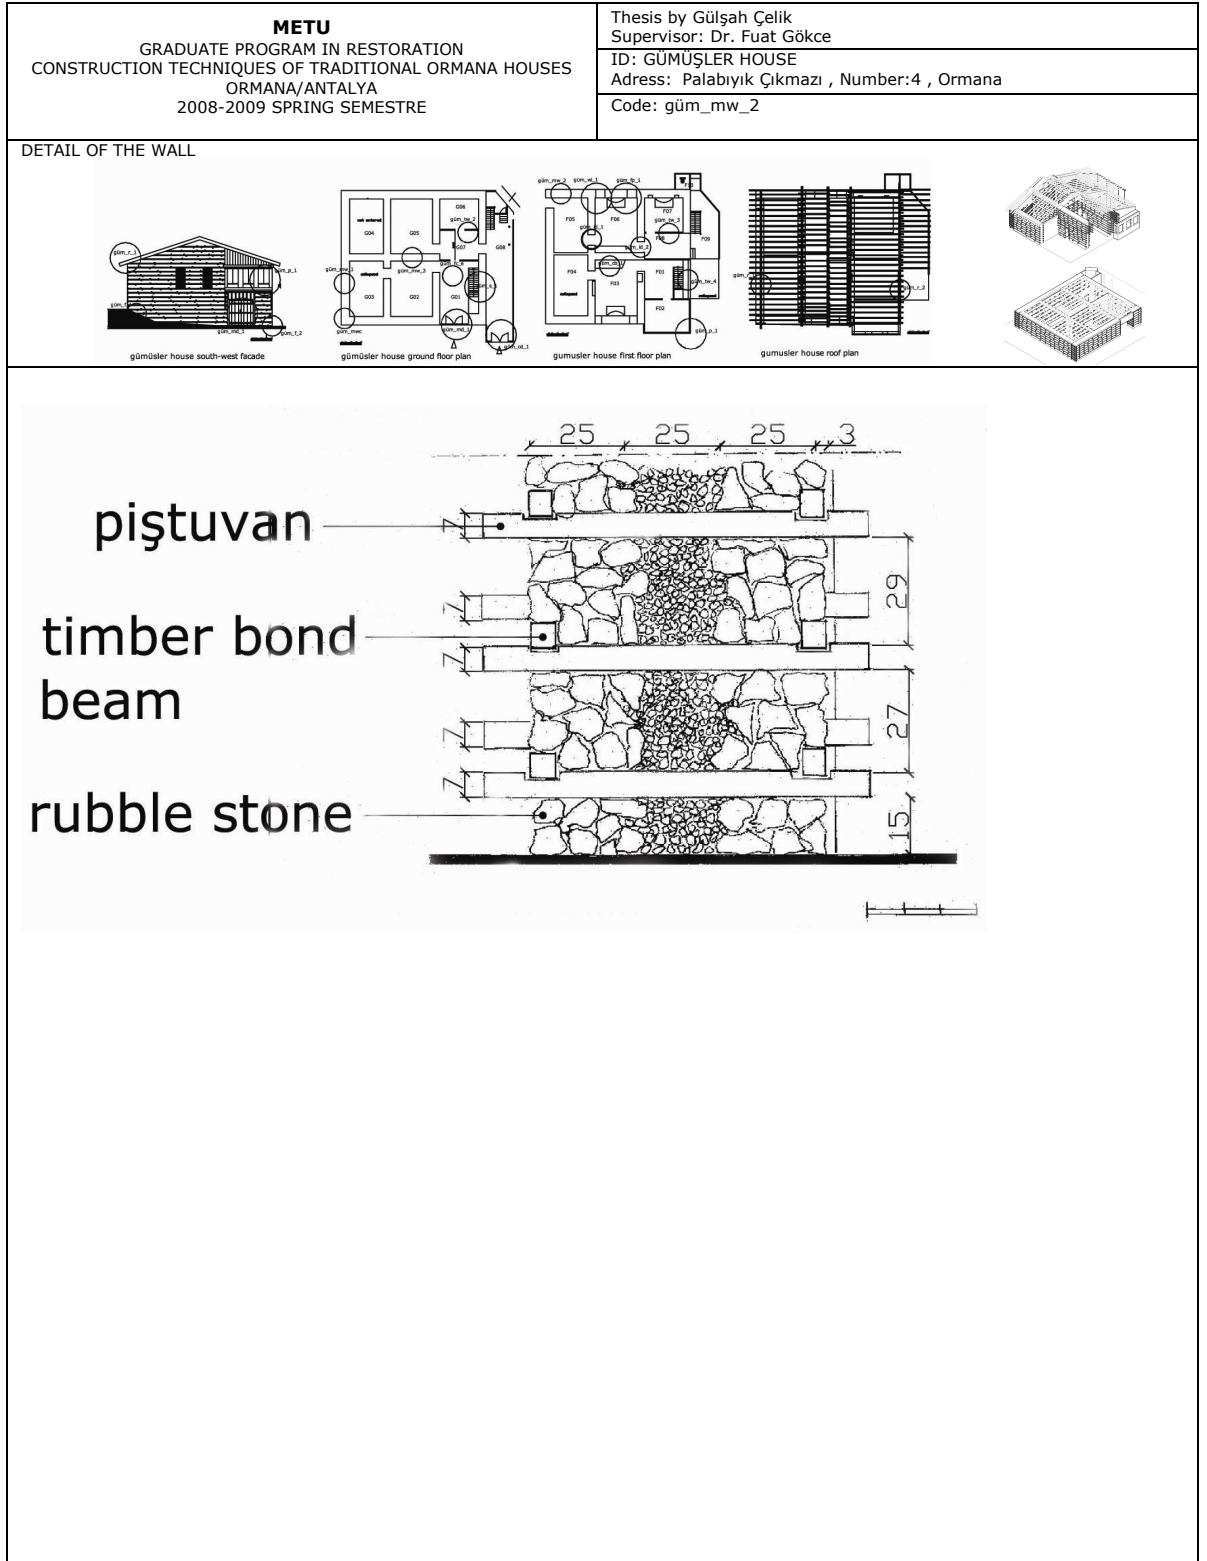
Record card of the detail of the wall of the Gümüşler House. Çelik, 2008.
